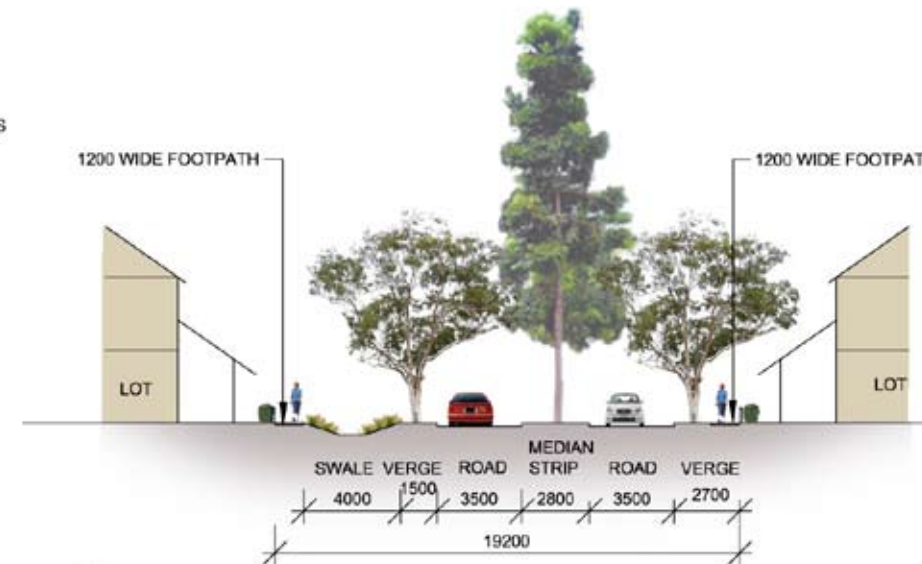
Identity planting at Cooper Road marking new primary local street without parking leading to park
